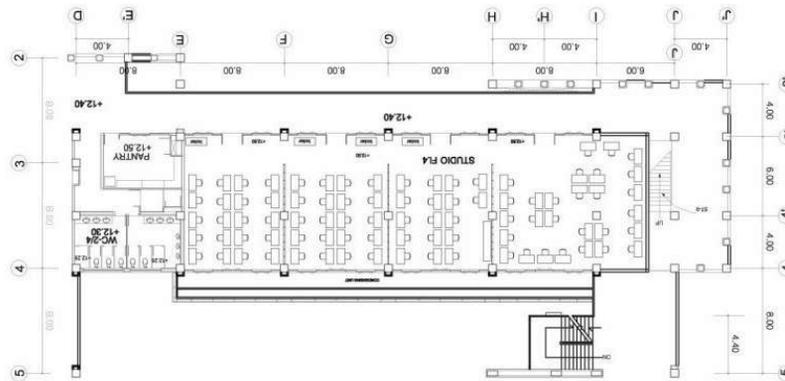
Existing Furniture lay out AR-412-1/AR-412-2 (Floor 4)
